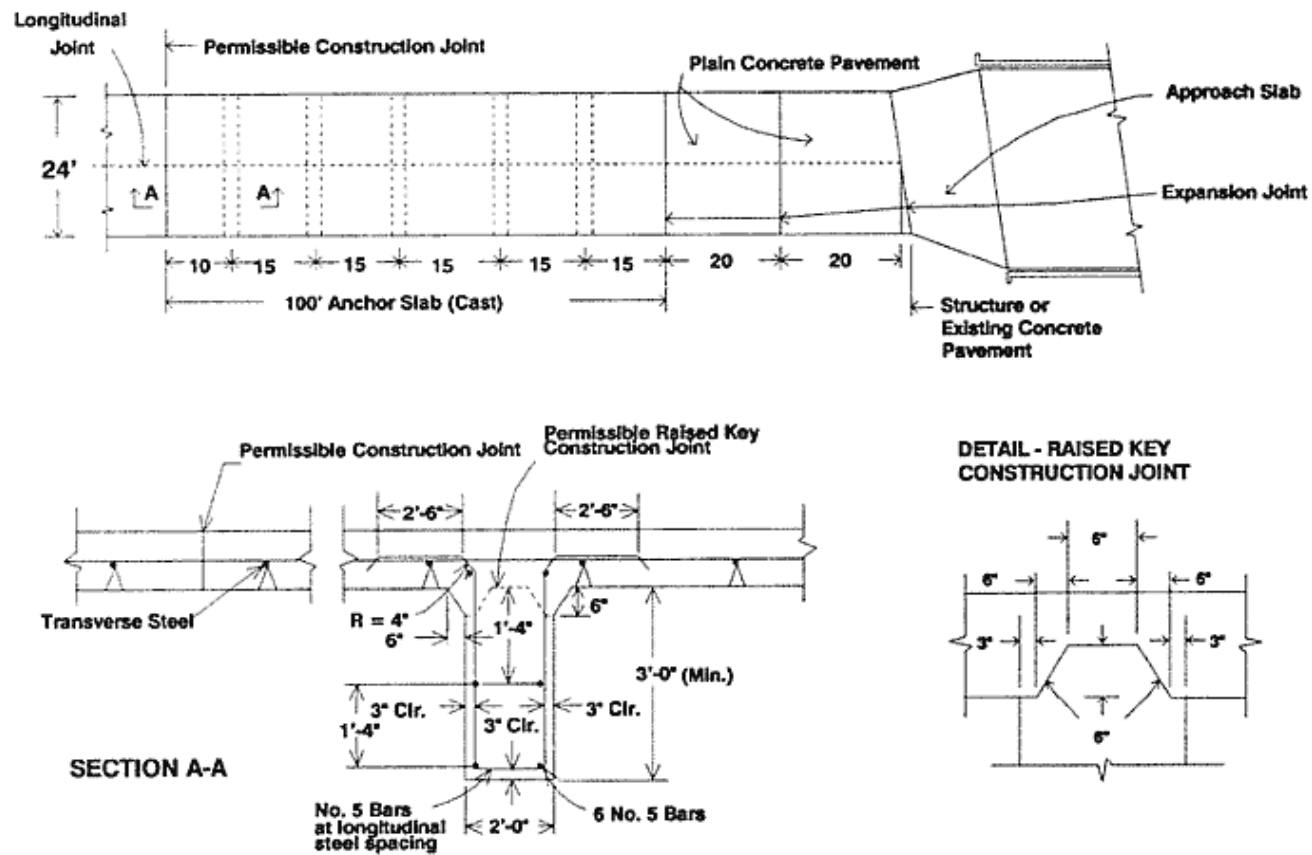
Lug Anchor Terminal Joint (<http://www.fhwa.dot.gov/legregs/directives/techadv/508014b.htm>).
